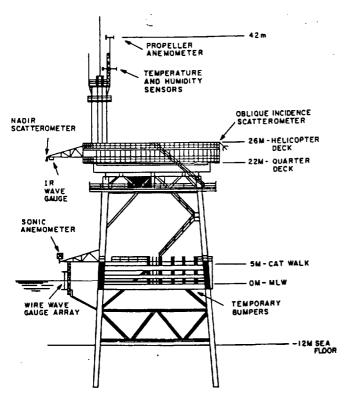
Side view of the Chesapeake Bay Light Tower as seen from the north showing typical dimensions and the location of instruments.
